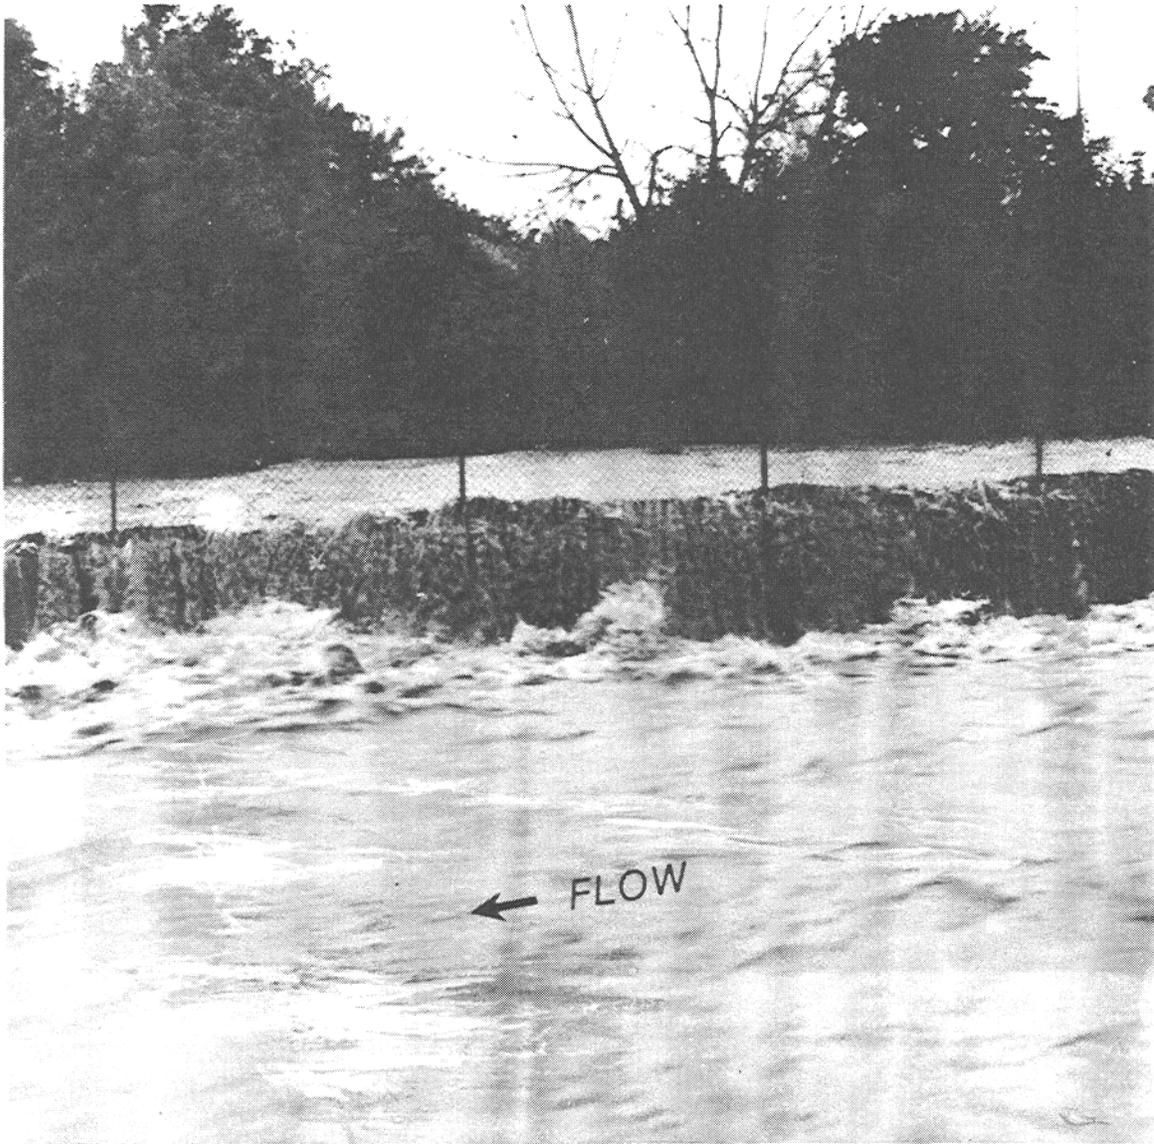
Flood of 16 February 1980, Los Angeles River at Cedros Street (view toward right bank, from location downstream of channel overflow in Photo No. 4-01).
